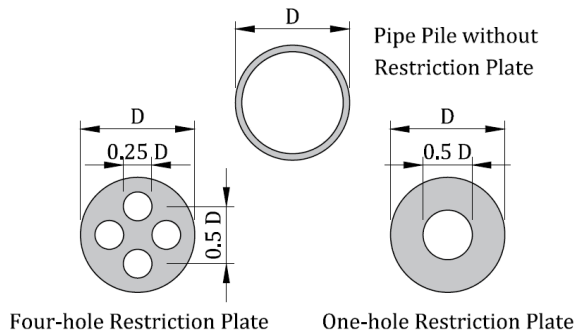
Restriction plates of various shapes that are mounted inside the pile foundation [9]
